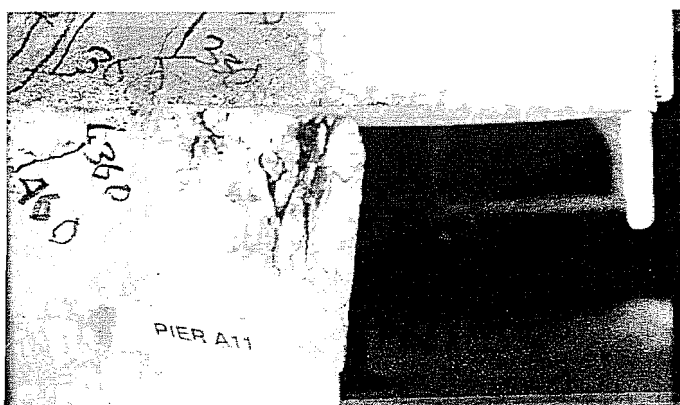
Crushing of Pier A1-1 after failure
